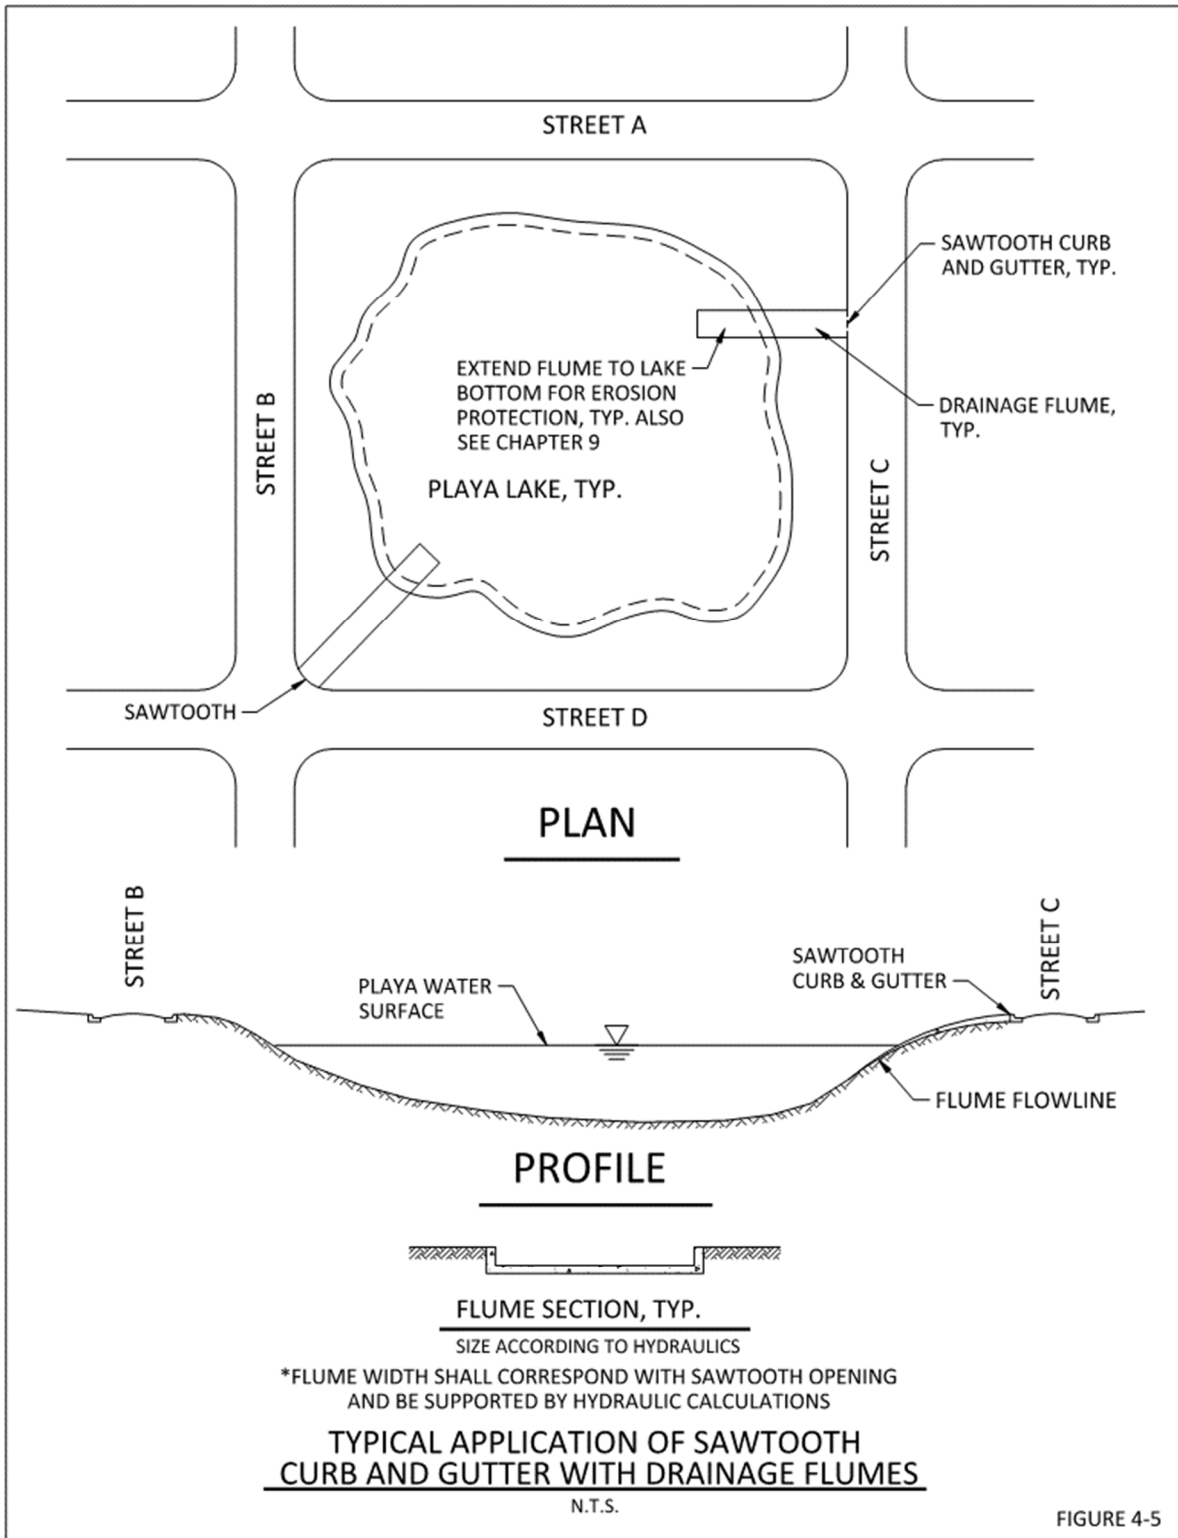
Typical Application of Sawtooth Curb and Gutter with Drainage Flumes
